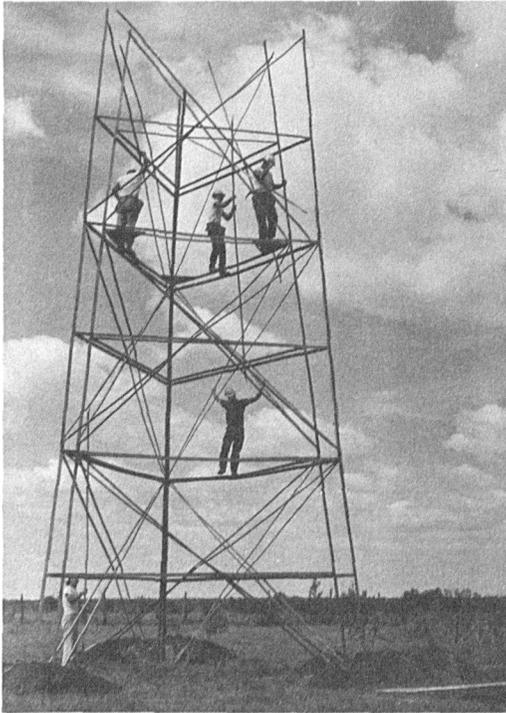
The 64-ft. section. Erecting the diagonals.
